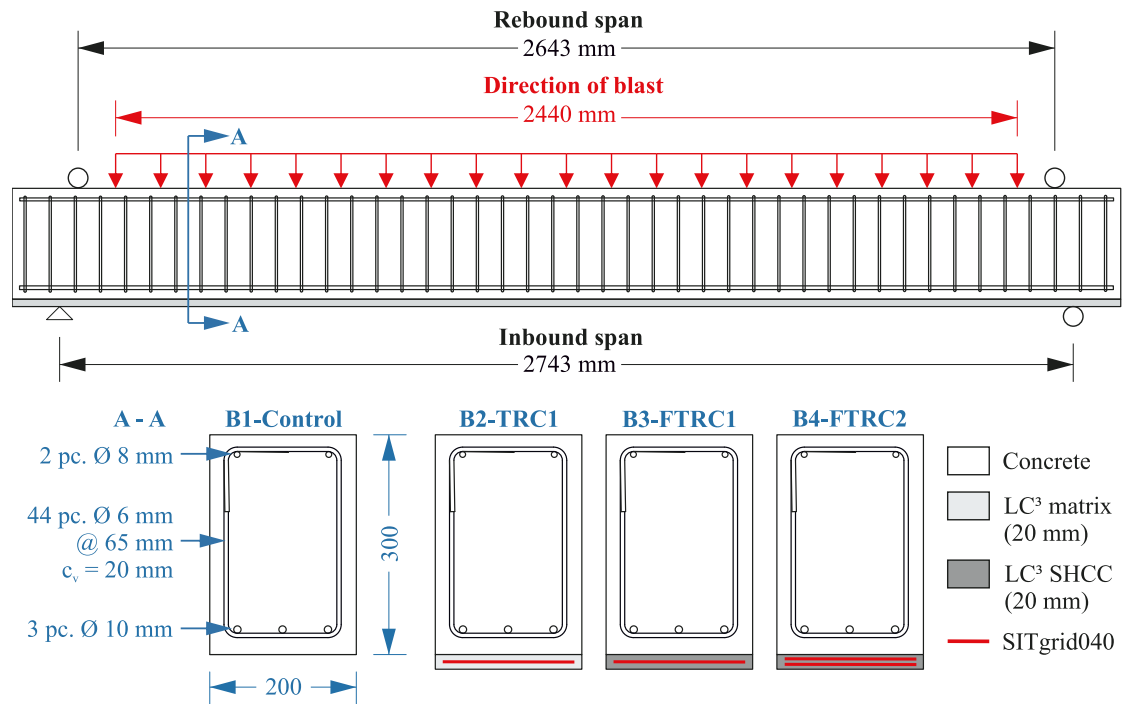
Test setup and specimen designs under investigation. In the beam designations, “B” stands for beam, “F” stands for fiber reinforcement, and “TRC1” and “TRC2” for textile-reinforced concrete with a single or a double textile layer, respectively.
